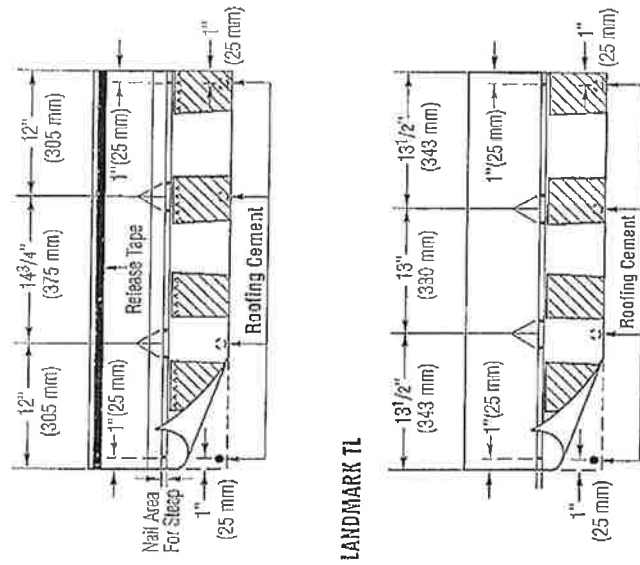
Use six nails and four spots of asphalt roofing cement on steep slopes.
